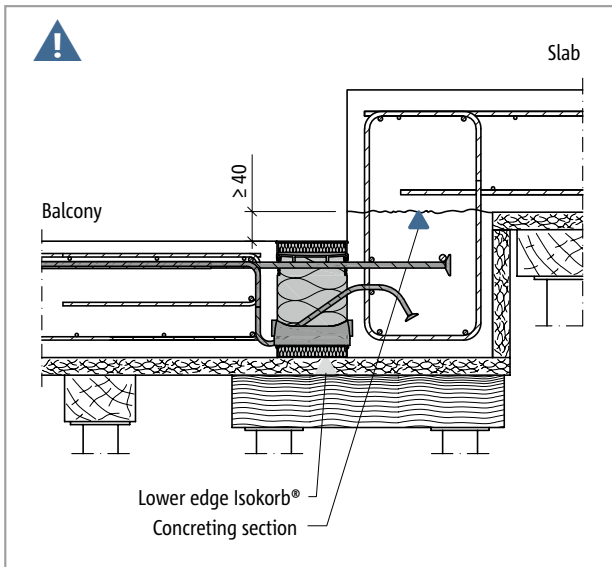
Schöck Isokorb® XT type K-U: In-situ concrete balcony with height offset downwards
